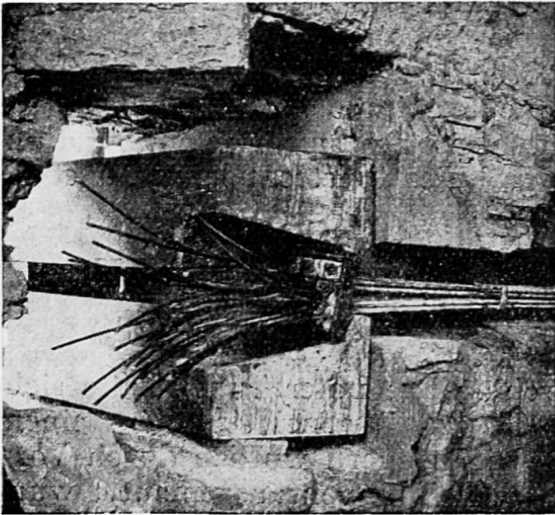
Tensioned wires at the anchorage at the end of the chase (see fig. 3).
